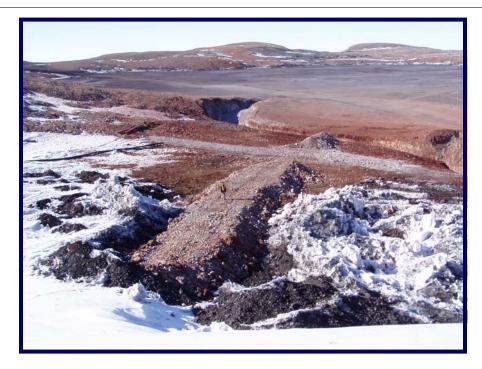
May 27, 2005 Water deflection berm near spillway access ramp. Note person on berm for scale.
